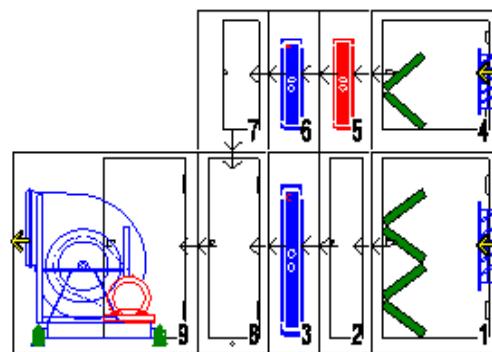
Energy Recover Wheel - Draw-thru Exhaust/Draw-thru Supply
